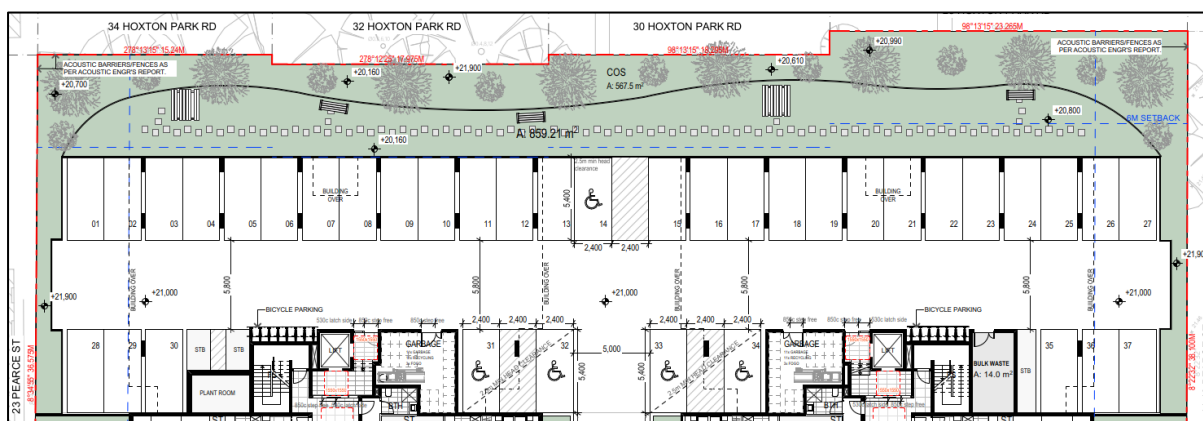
Extract of Ground Floor Plan (Source: Drawing No. A1001)
